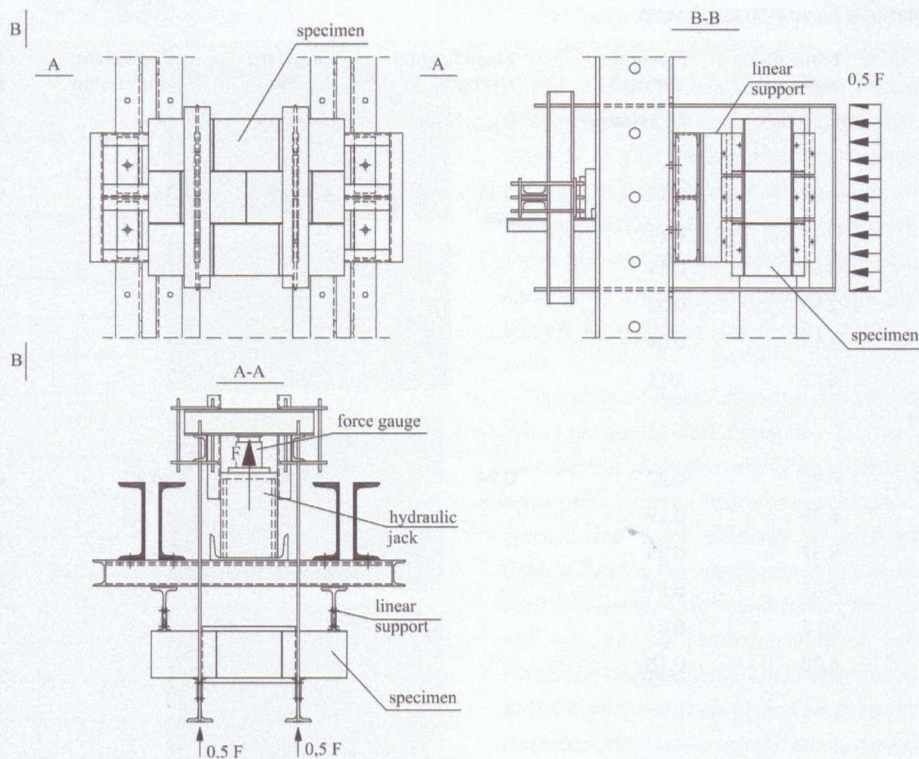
Scheme of stand for testing the flexural strength of masonry when plane of failure is perpendicular to the bed joints
